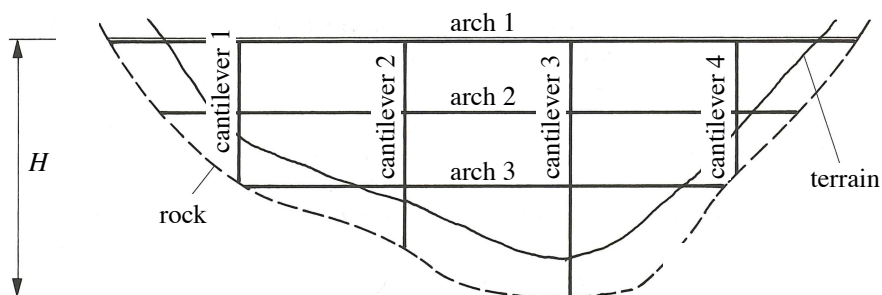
Modelling an arch dam by arches and cantilevers (consoles) (adapted from Schleiss and Pougatsch, 2011).
